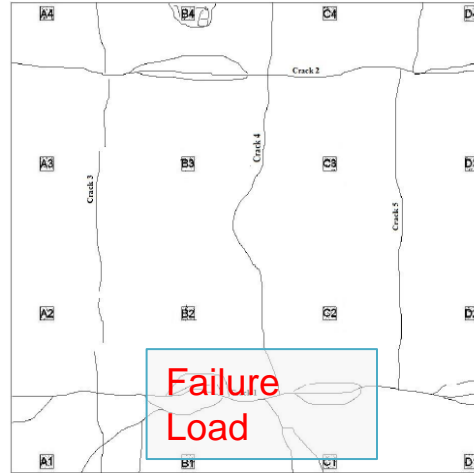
Bottom of Slab Crack Pattern at Ultimate Load
